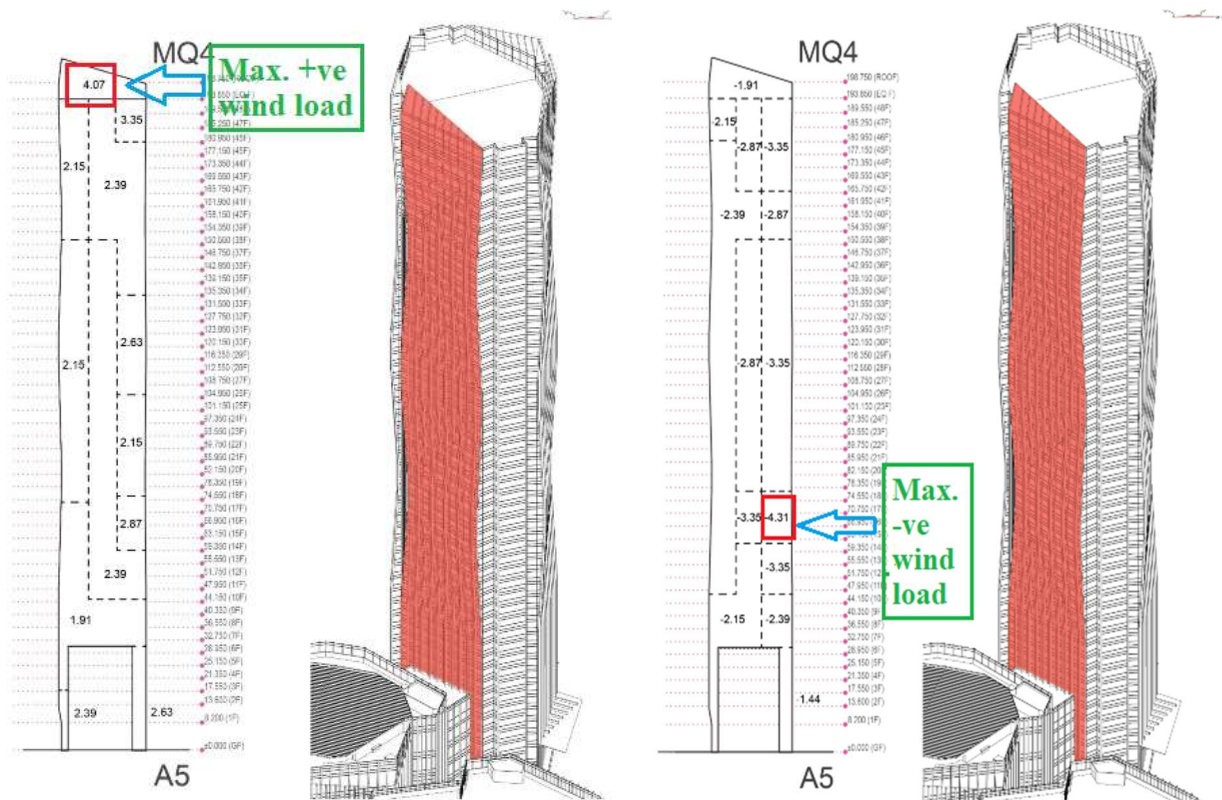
Positive and negative design wind loads on curtain wall based on the wind tunnel test output
